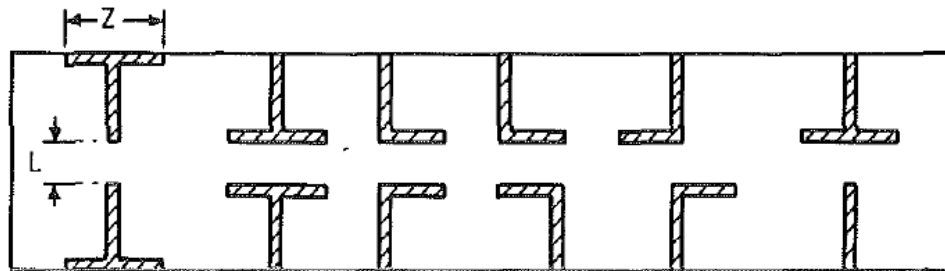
The plan of different T and L shaped coupled flanged shear wall system
